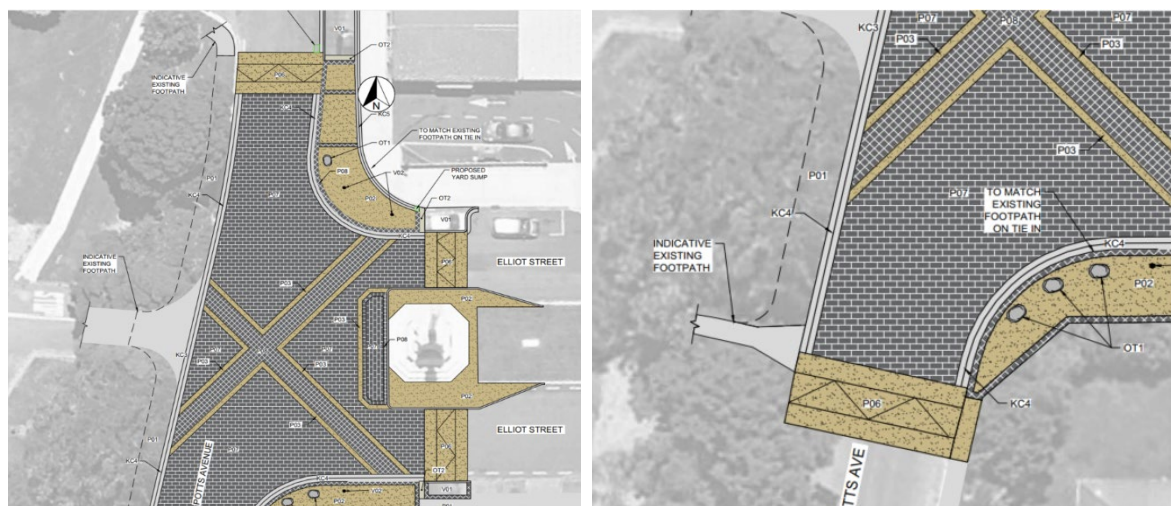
The design of the raised platform in Elliott Street / Potts Ave intersection
